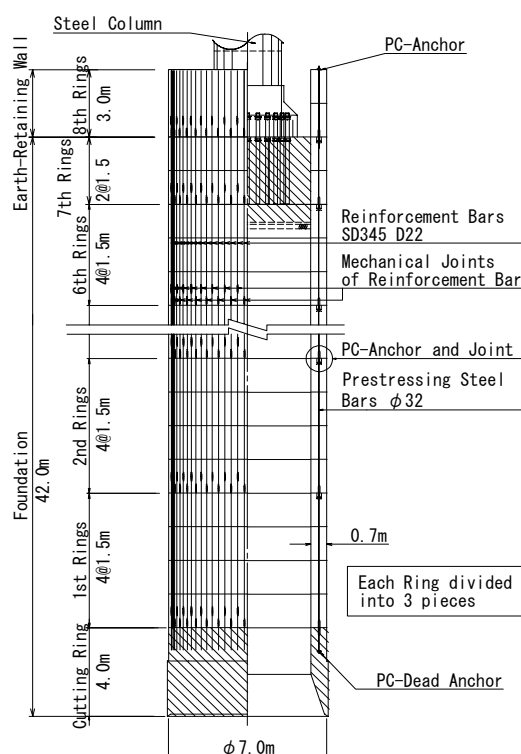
Structural Drawing of Precast Prestressed-reinforced Concrete Caisson
